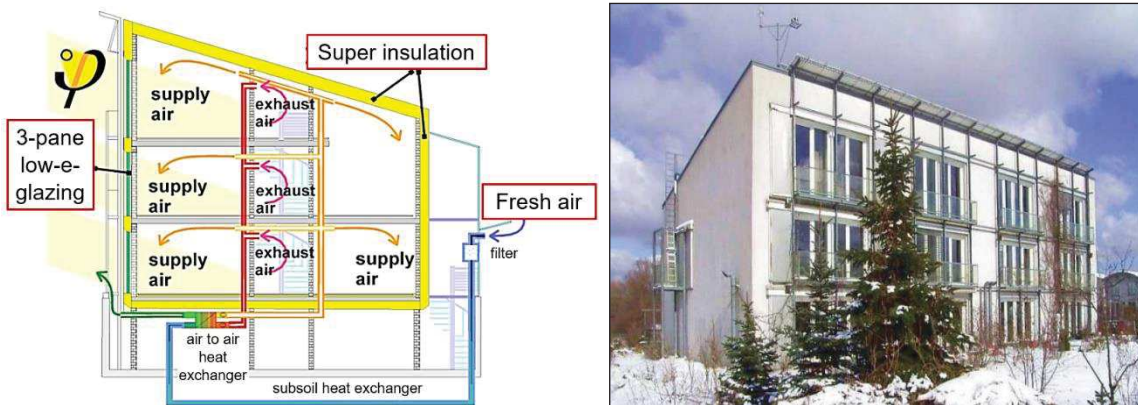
First passive house built in 1990/1991 in Darmstadt-Kranichstein, Germany (Architects: Bott, Ridder, Westermeyer): design concept (left) and on-site construction (right) (Feist 1999).
